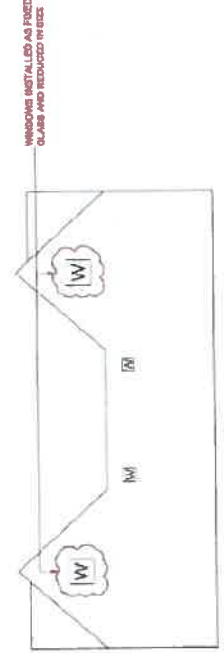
UNIT BLOCK B - NORTH ELEVATION
